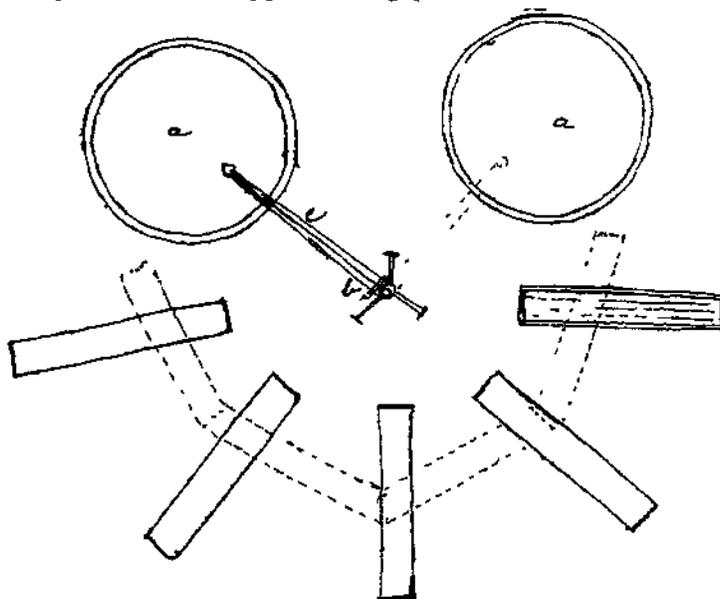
Top view of arrangement of two pit silos, *a*, with swinging derrick, *b*, with which to remove the silage. The derrick or crane should have a long arm which will reach out to the feeding troughs, thus saving the expense of another handling of silage. The feeding troughs may be arranged as shown by dotted lines, which, however, will not give as much feeding room. The derrick, in this case, will have to be held in place by three stays—or the main post may be extended so that long guy wires may be used.
